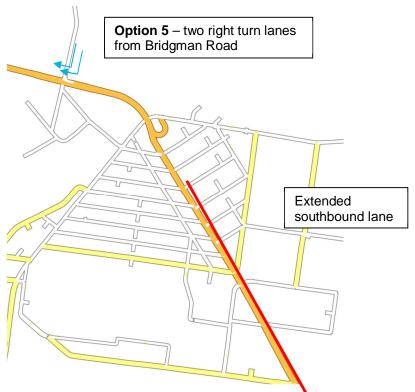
'In town' option 5 - modification of intersection layout at Bridgman Road plus In town option 3
